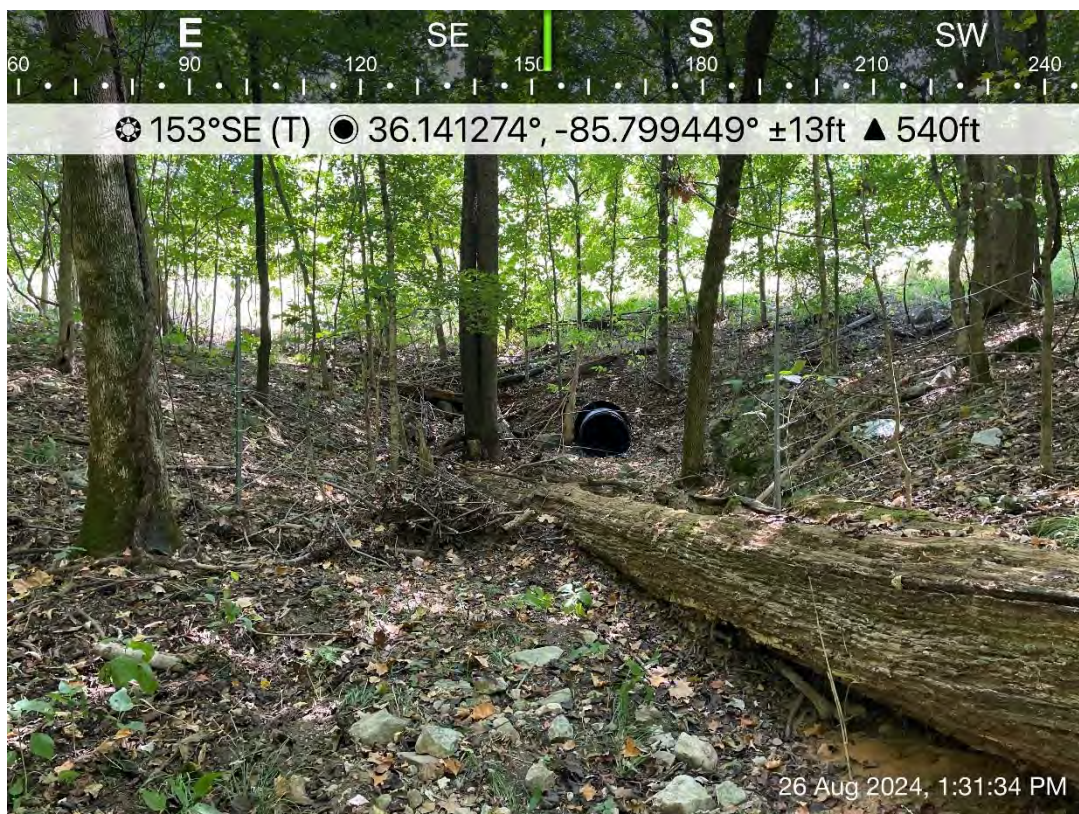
WWC-4 looking down gradient at culvert inlet north of I-40
